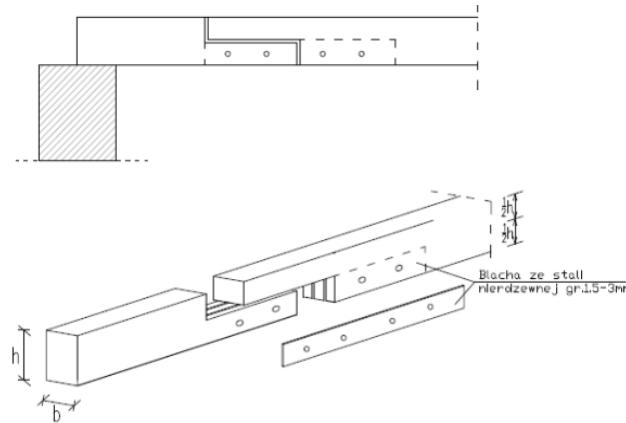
Replacement of the damaged beam fragment using the inserts made of flat steel plate with a thickness of 1.5 to 3 mm and stud connectors (drawing: E. Piotrowicz)
